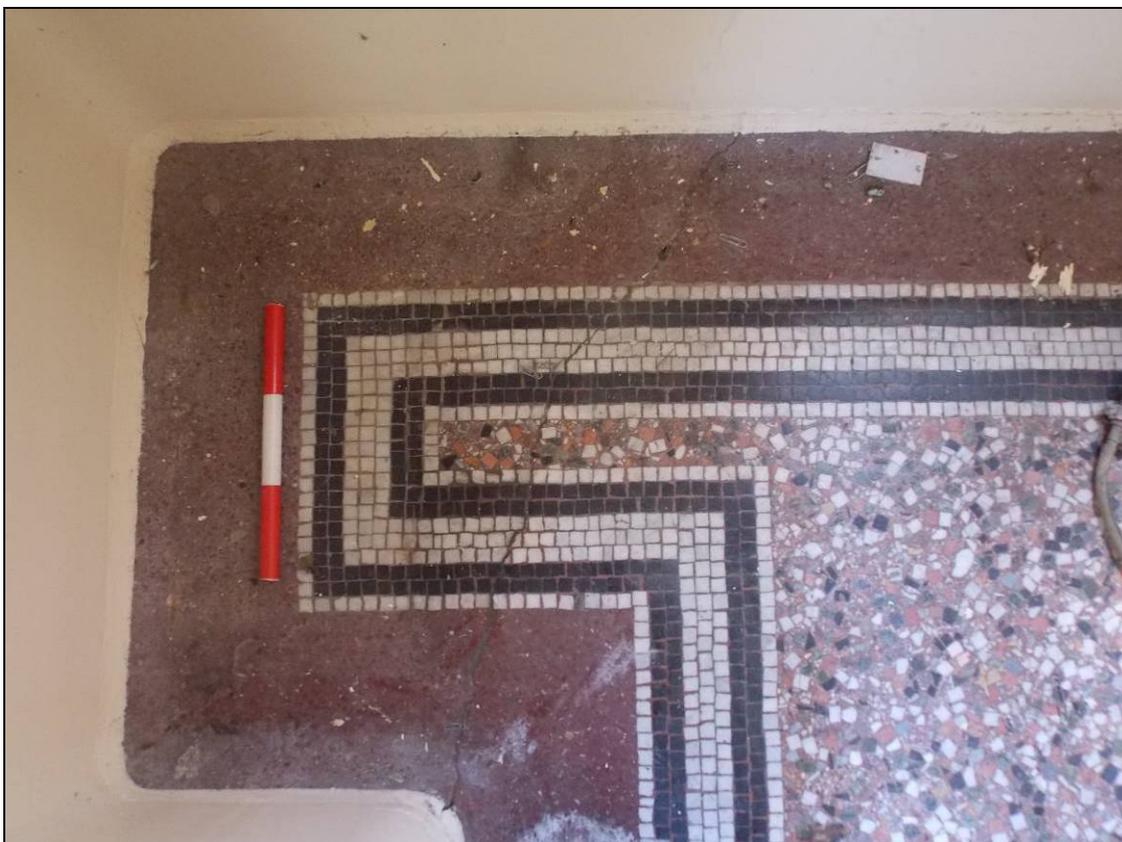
Detail of screed patterned floor with mosaic band, looking south (scale 300mm).
